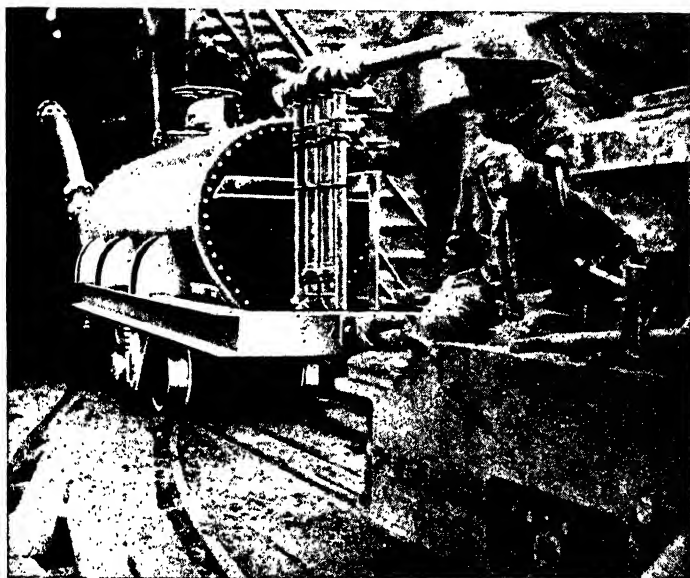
Rail-mounted 3-yd. pneumatic concrete gun used to transport as well as place the concrete. (Courtesy of Union Iron Works.)
